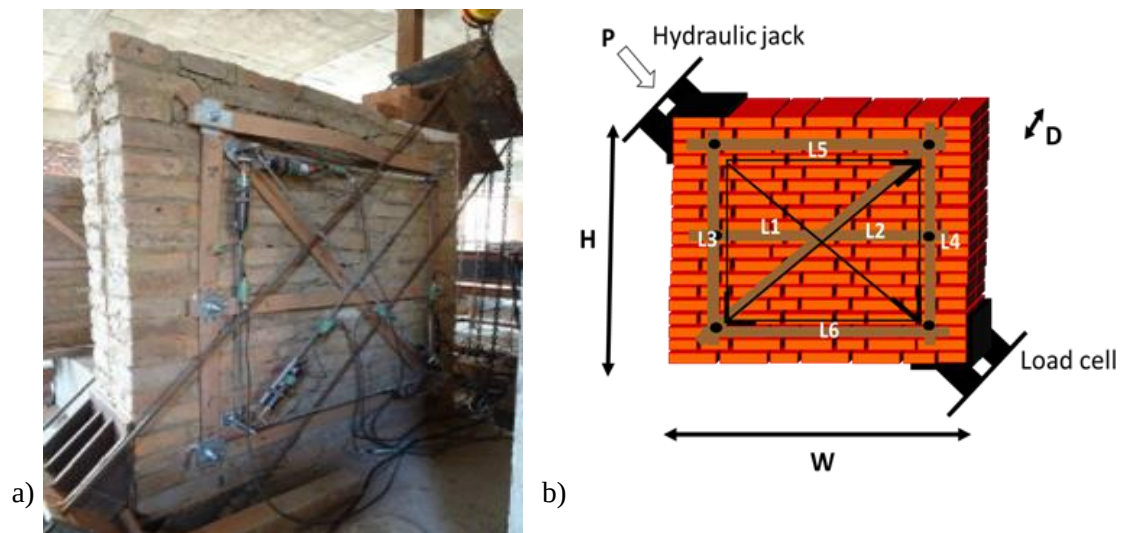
a) Diagonal compression test of timber reinforced masonry (TRM) specimen b) Schematic diagram of diagonal compression test set up of TRM specimen
